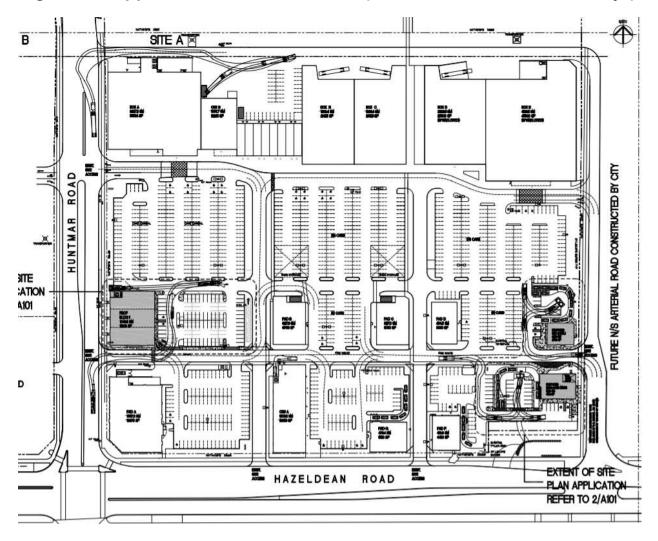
Approved 'Master' Site Plan (revised March 19/19 - excerpt)
